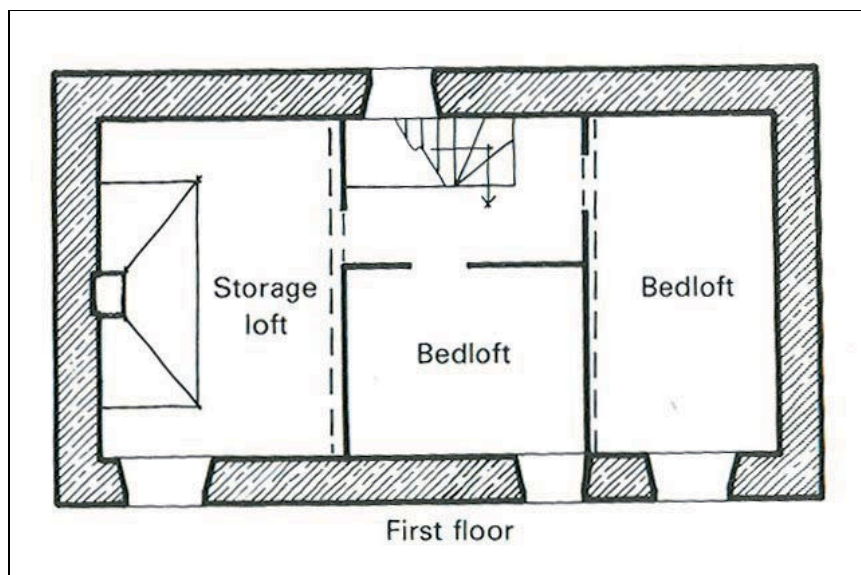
Sketch plan showing what the original layout of the first floor of the earliest phase of the house may have been (Source: Denyer 1991)
